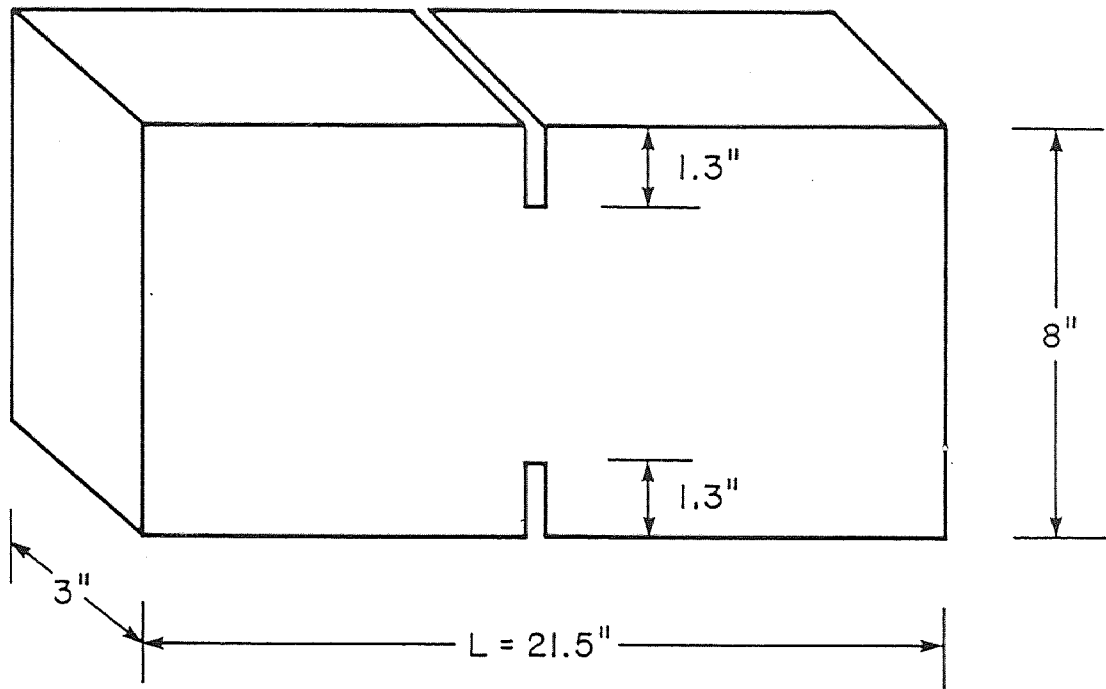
DIMENSIONS OF DOUBLE NOTCH SPECIMEN
